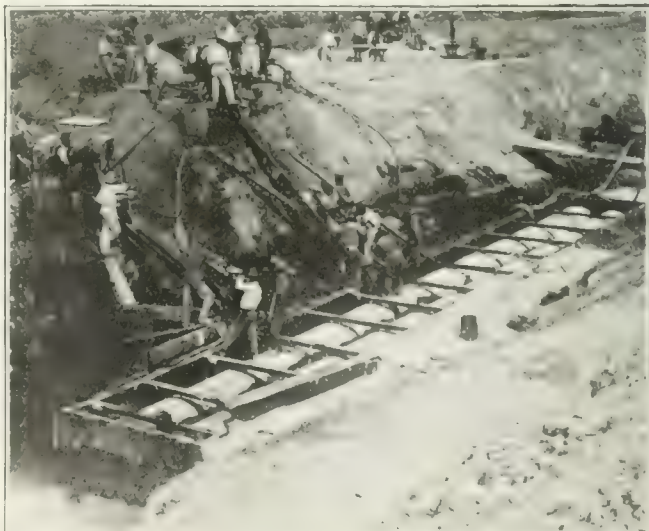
CULVERT CARRYING DRAINAGE UNDER ROADS AND IRRIGATION CANALS
